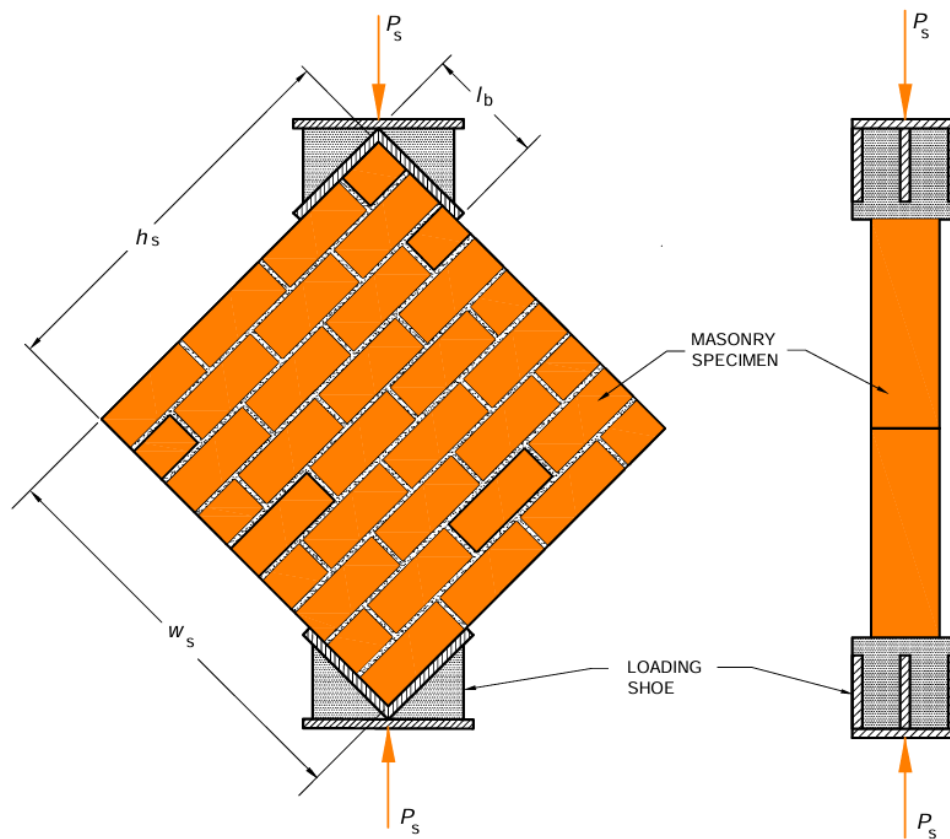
WALL SPECIMEN FOR DIAGONAL COMPRESSION TEST
